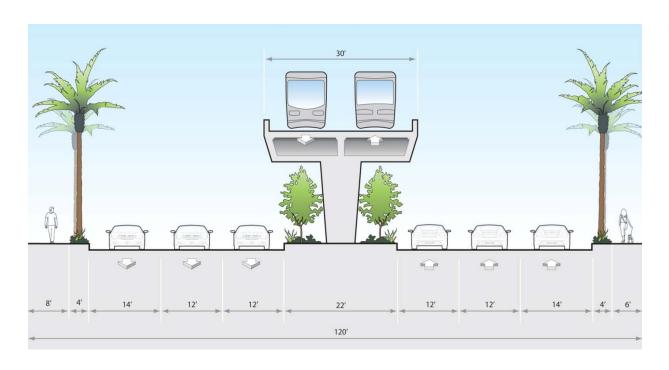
Elevated Fixed-Guideway Alternative: Typical Cross-Sections
